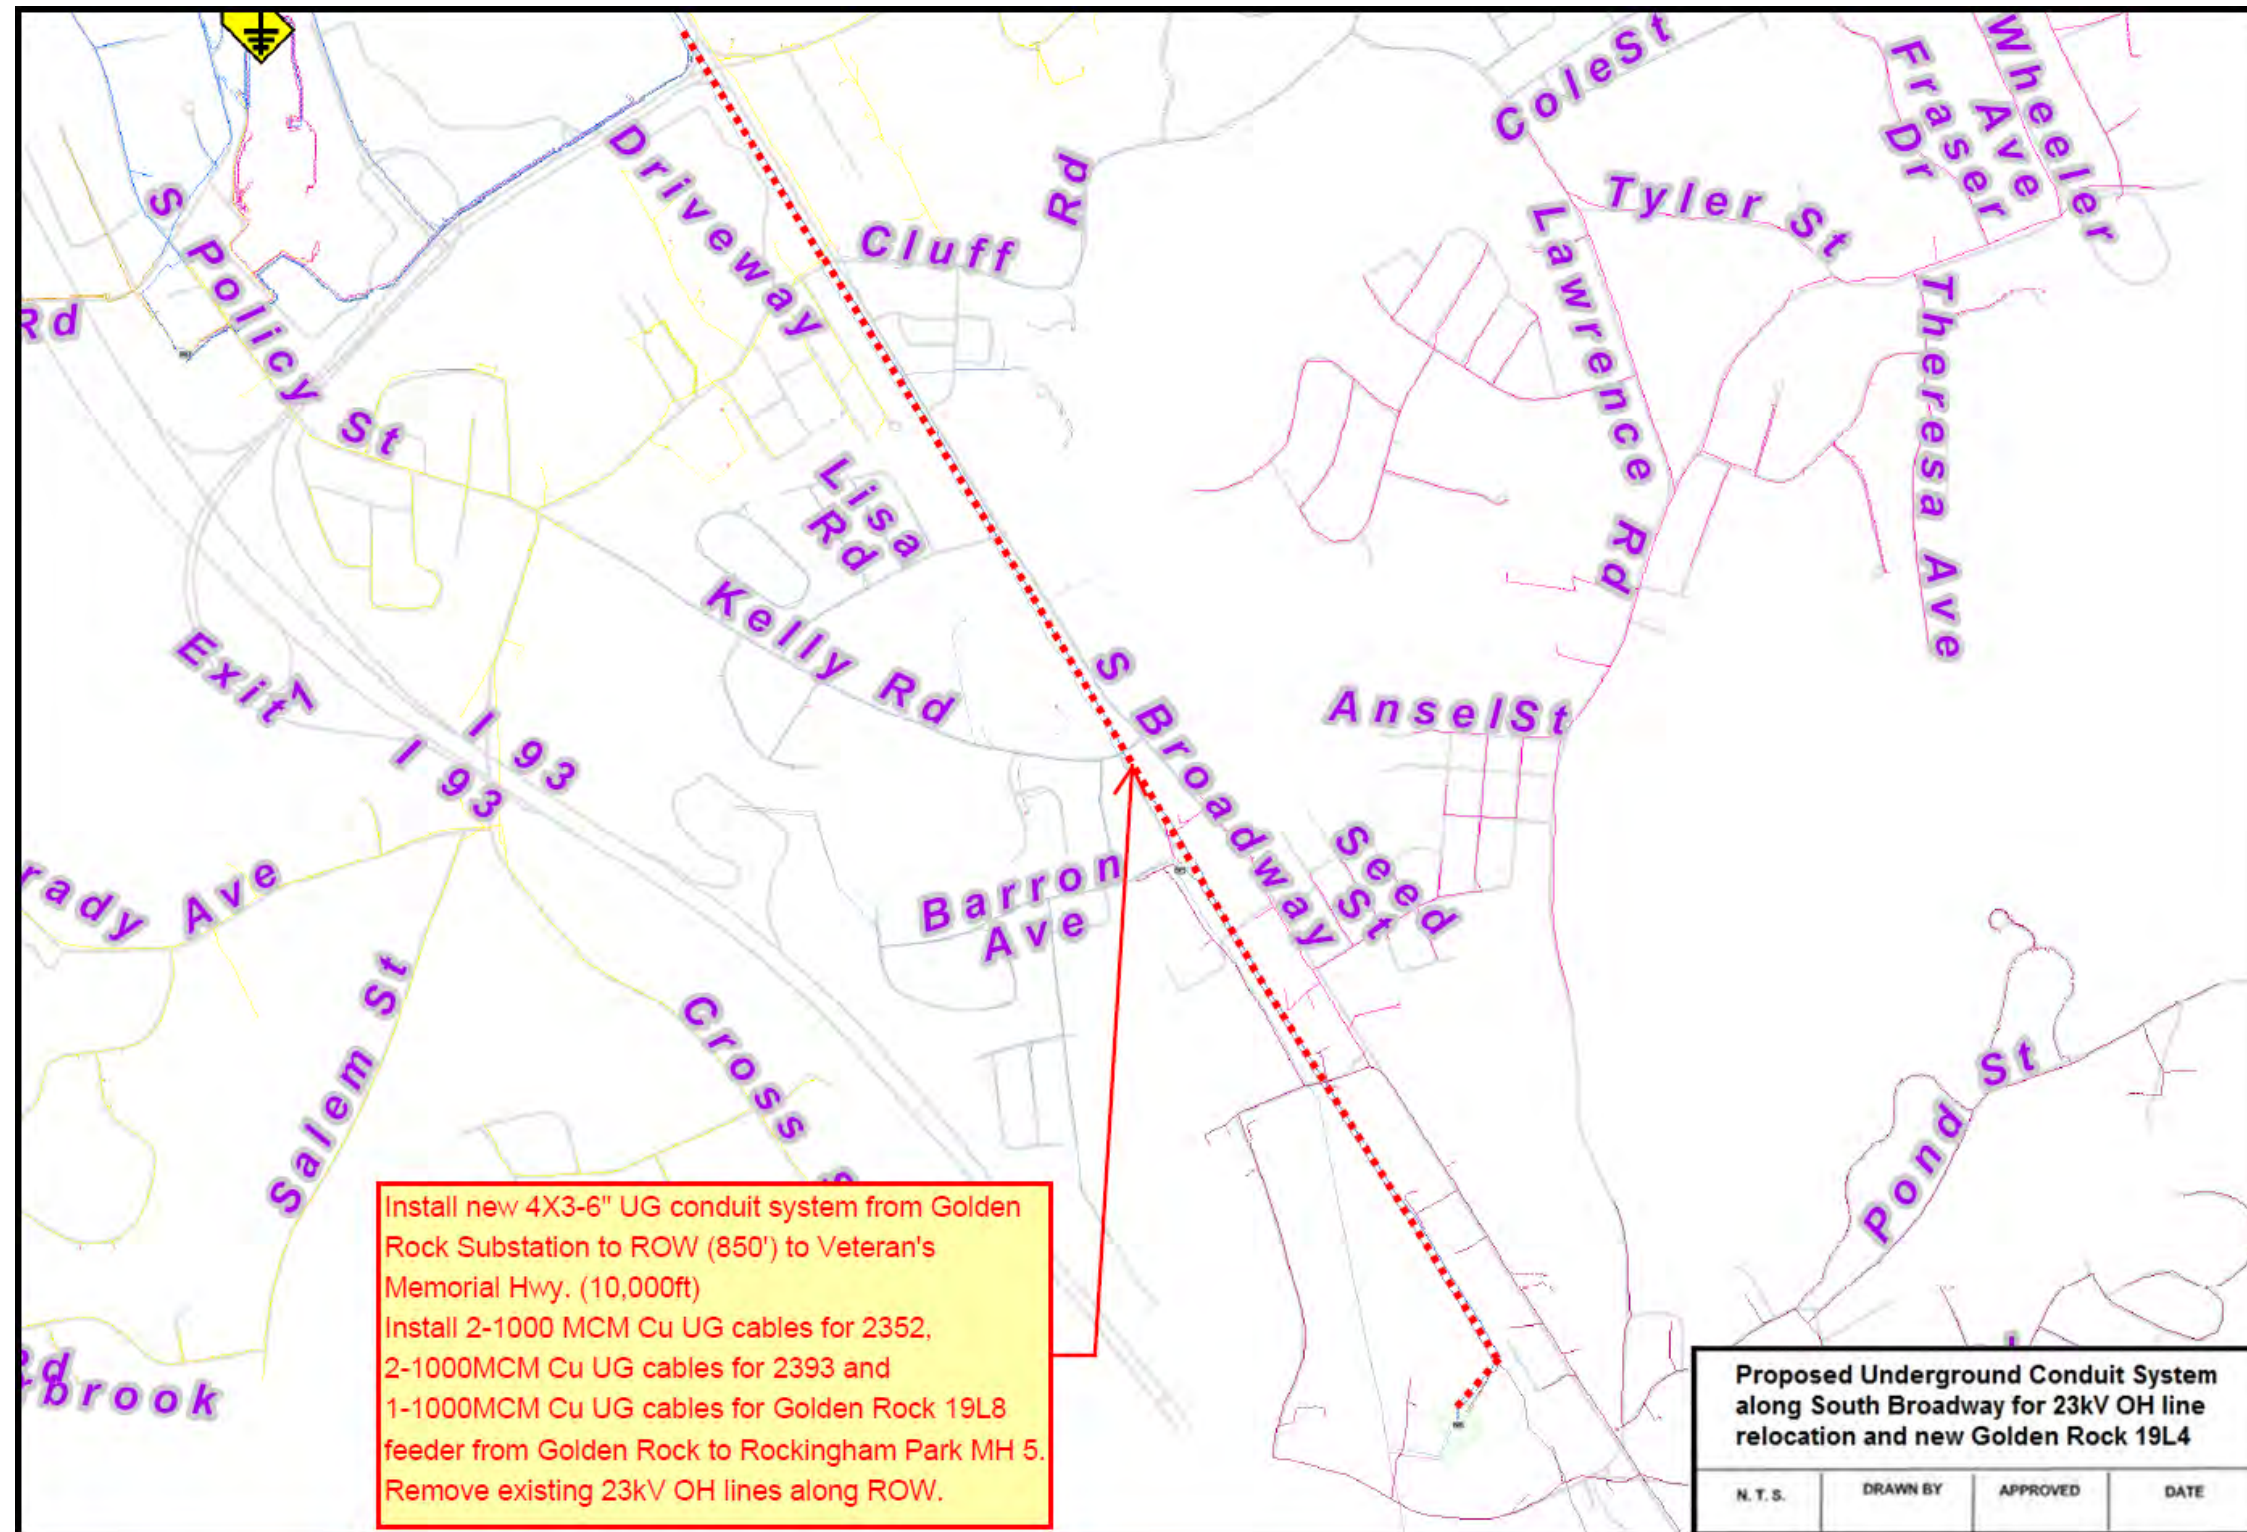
Recommended Plan Phase Two Proposed Right-of-Way Underground Conduit System
